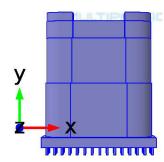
3-D Euler Beam Multi-girder Bridge Model
